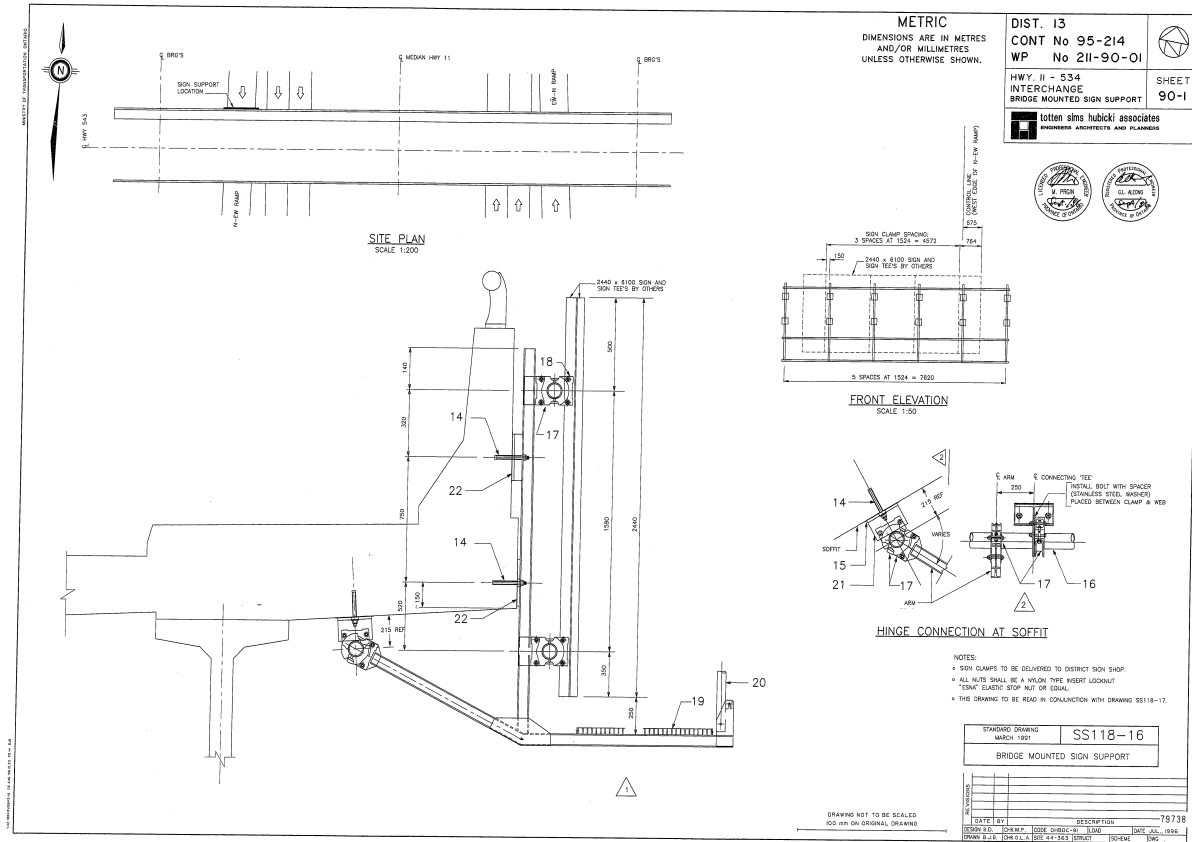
(a) GENERAL LAYOUT DRAWING
